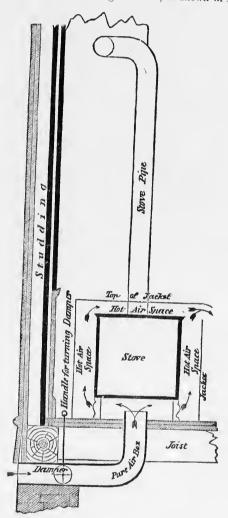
Section through Stove, &c., showing Pure Air Pipe, or Box, and Jacket.
